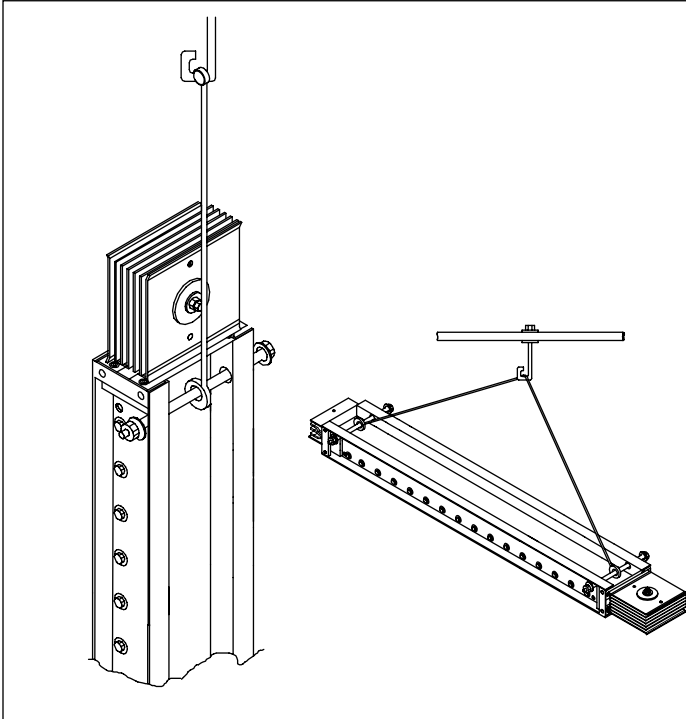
Hoisting Riser and Horizontal Busway
